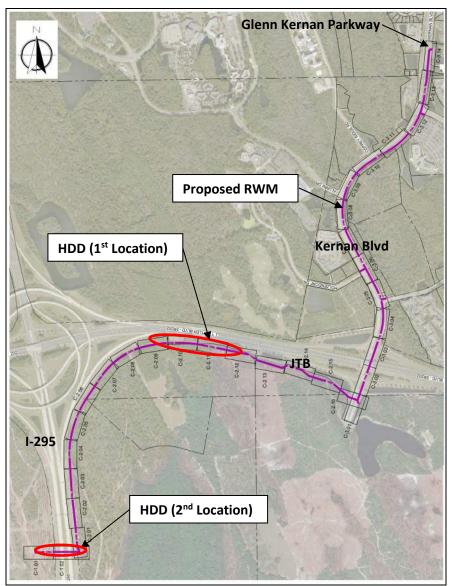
Reclaimed Water Main Alignment and HDD Locations
